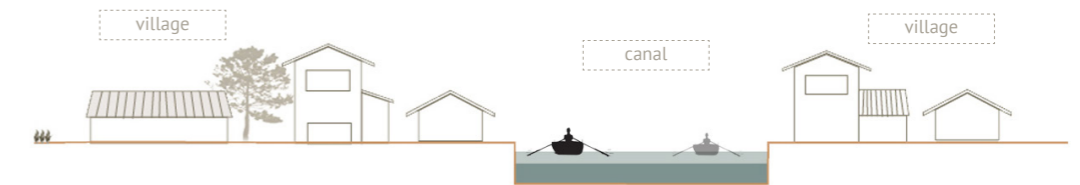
Section b-b' detail 2: experiment of widening the canal 1
